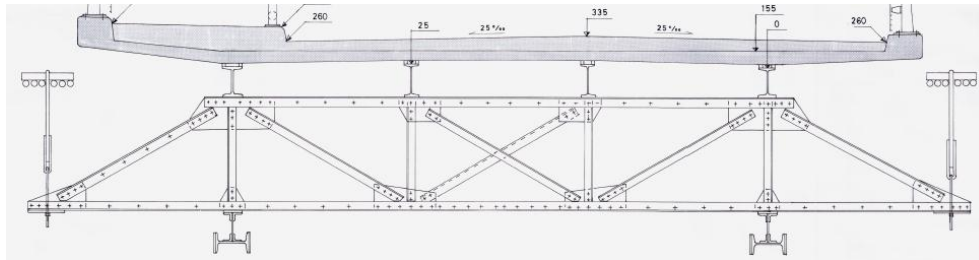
Current in-span cross section with 8,7 m wide deck
